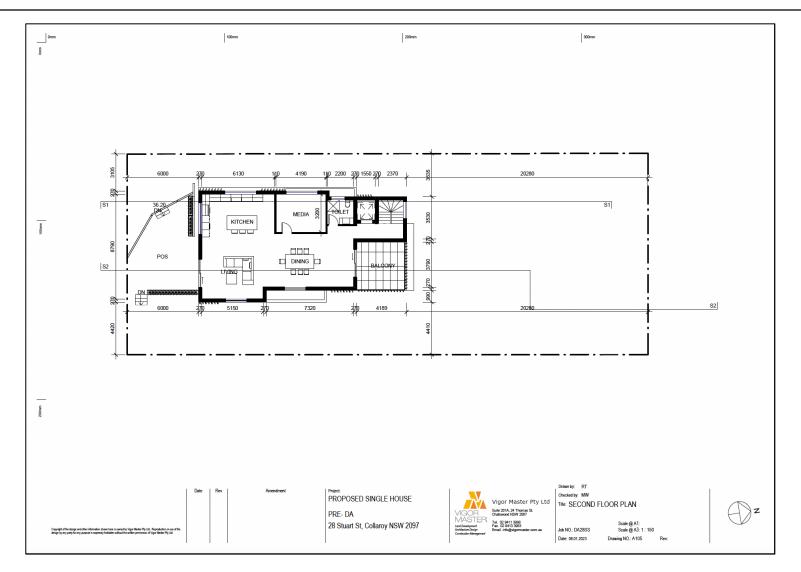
ILLUSTRATES PROPOSED SECOND FLOOR PLAN
